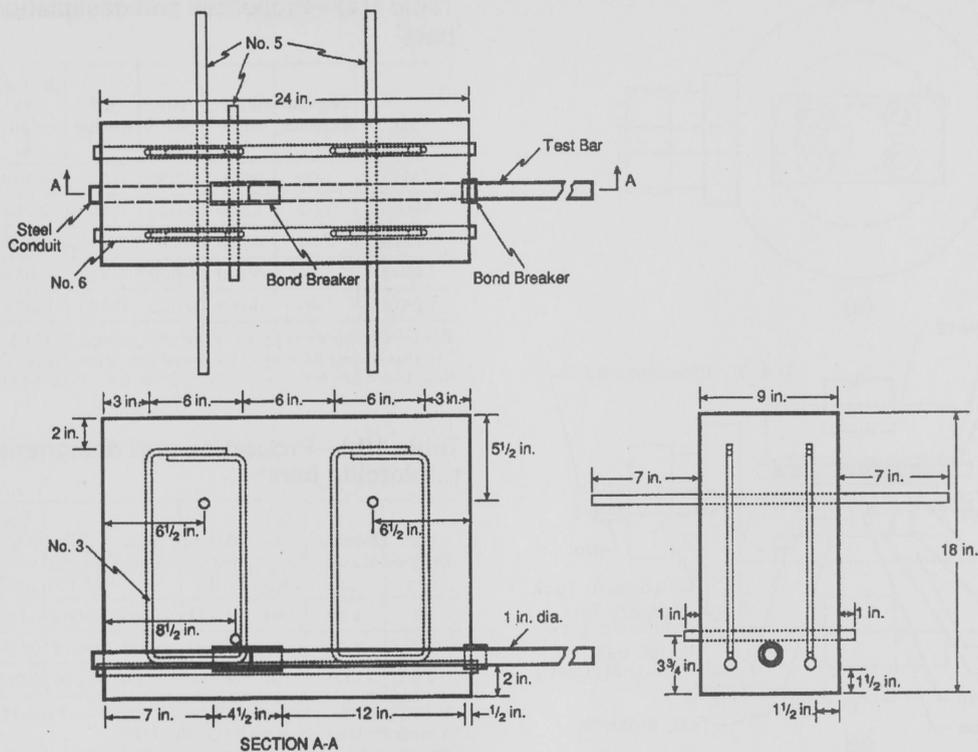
Beam-end test specimen (ASTM A 944) (1 in. = 25.4 mm).
